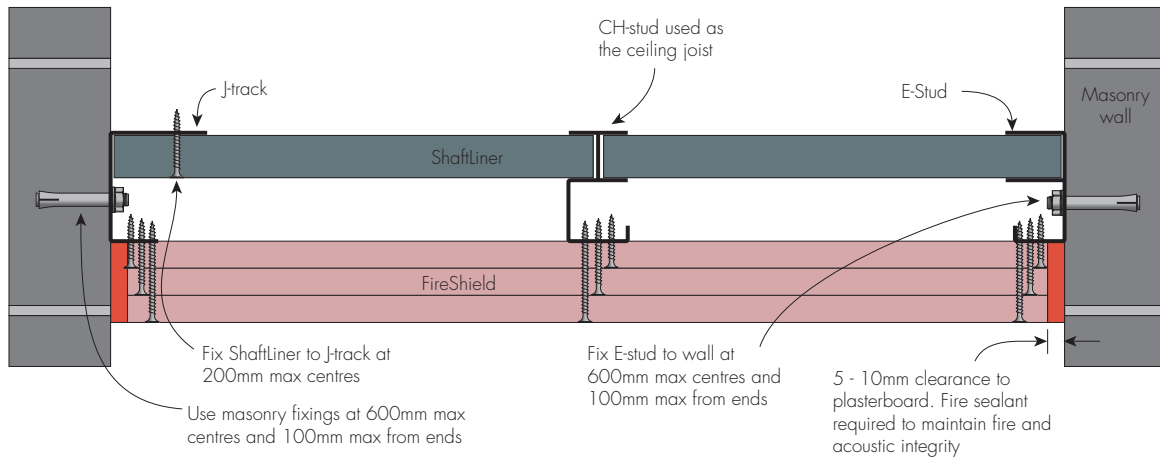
Horizontal Shaft Wall Non-Trafficable Ceiling to Masonry Wall
